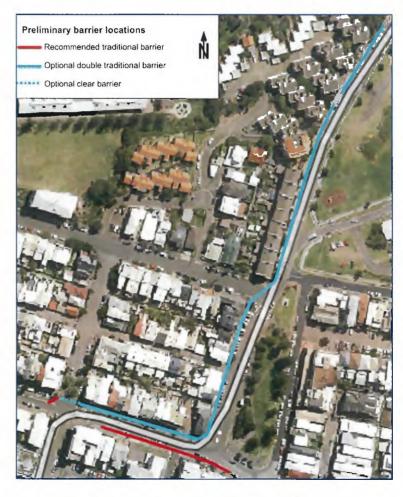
Preliminary locations for Scott Street< Parnell Place and Nobbys Road barriers
